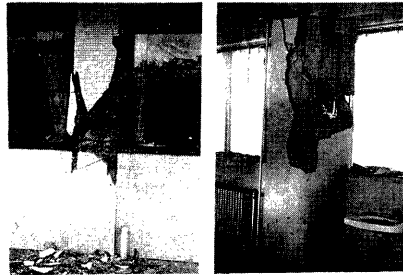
Shear failure of columns (Tohoku Institute of Technology).
